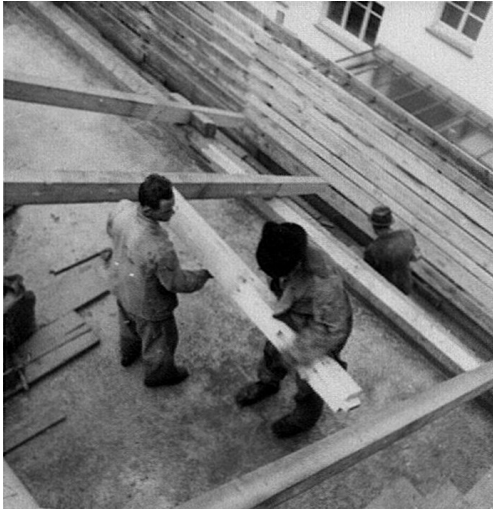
Workers lifting up, and locating a timber beam to construct a regular timber truss roof.
